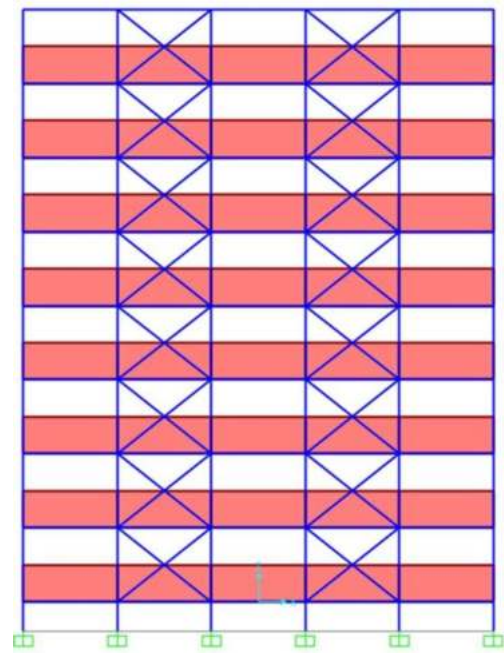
Elevation of 50% Partially in-filled Frame with Bracings
